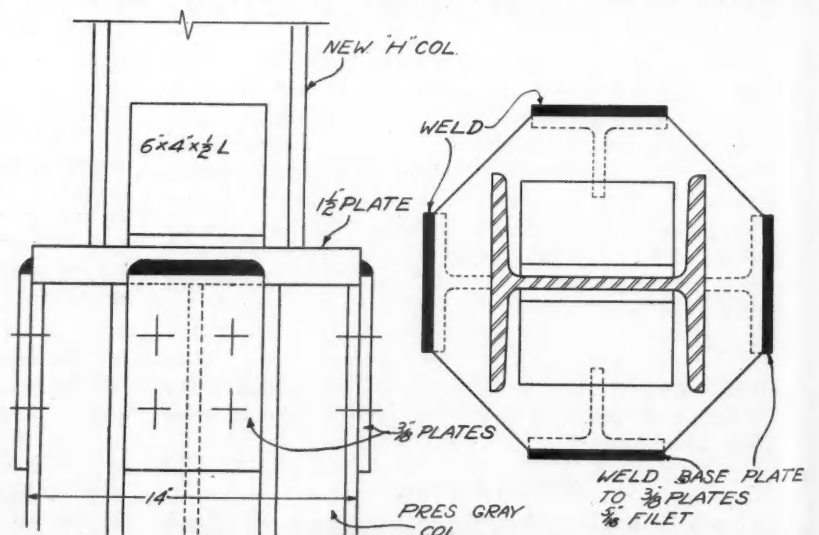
Plan and Elevation of New Column Base Plate Welded to Top of Old Gray Type Column.
